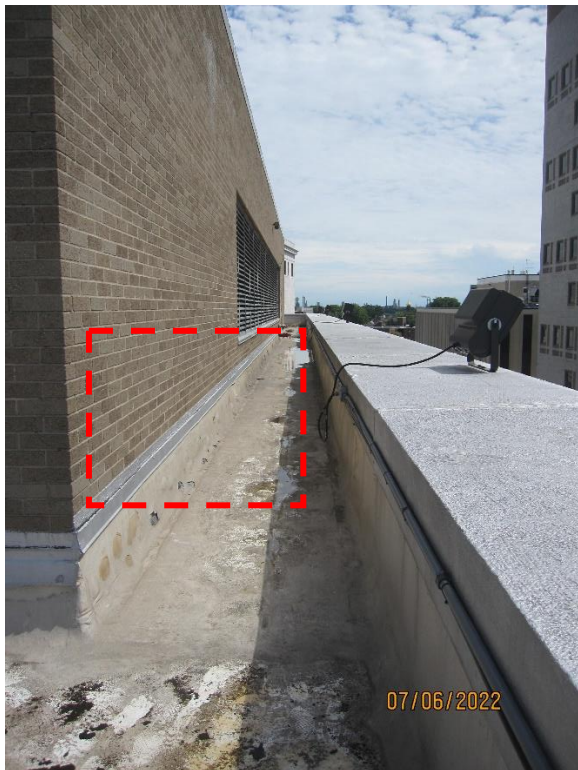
View of the surface mounted and reglet type counter flashings located on the penthouse walls.
